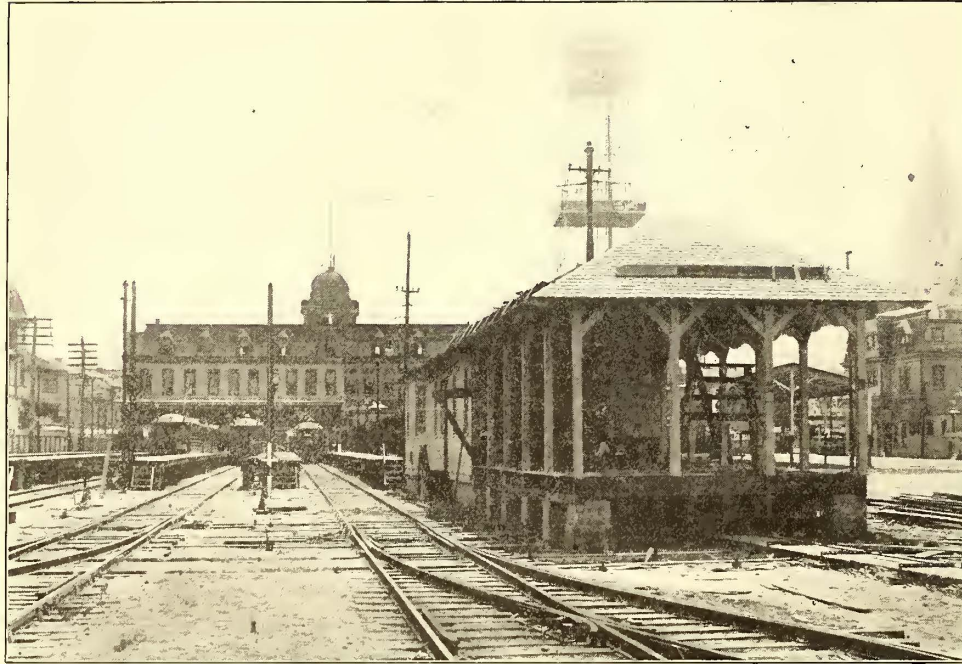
VIEW OF THE ELEVATED TERMINAL TRACKS, SHOWING PLATFORMS, TRAINMEN'S PAVILION AND OFFICE BUILDING AT THE RIGHT
